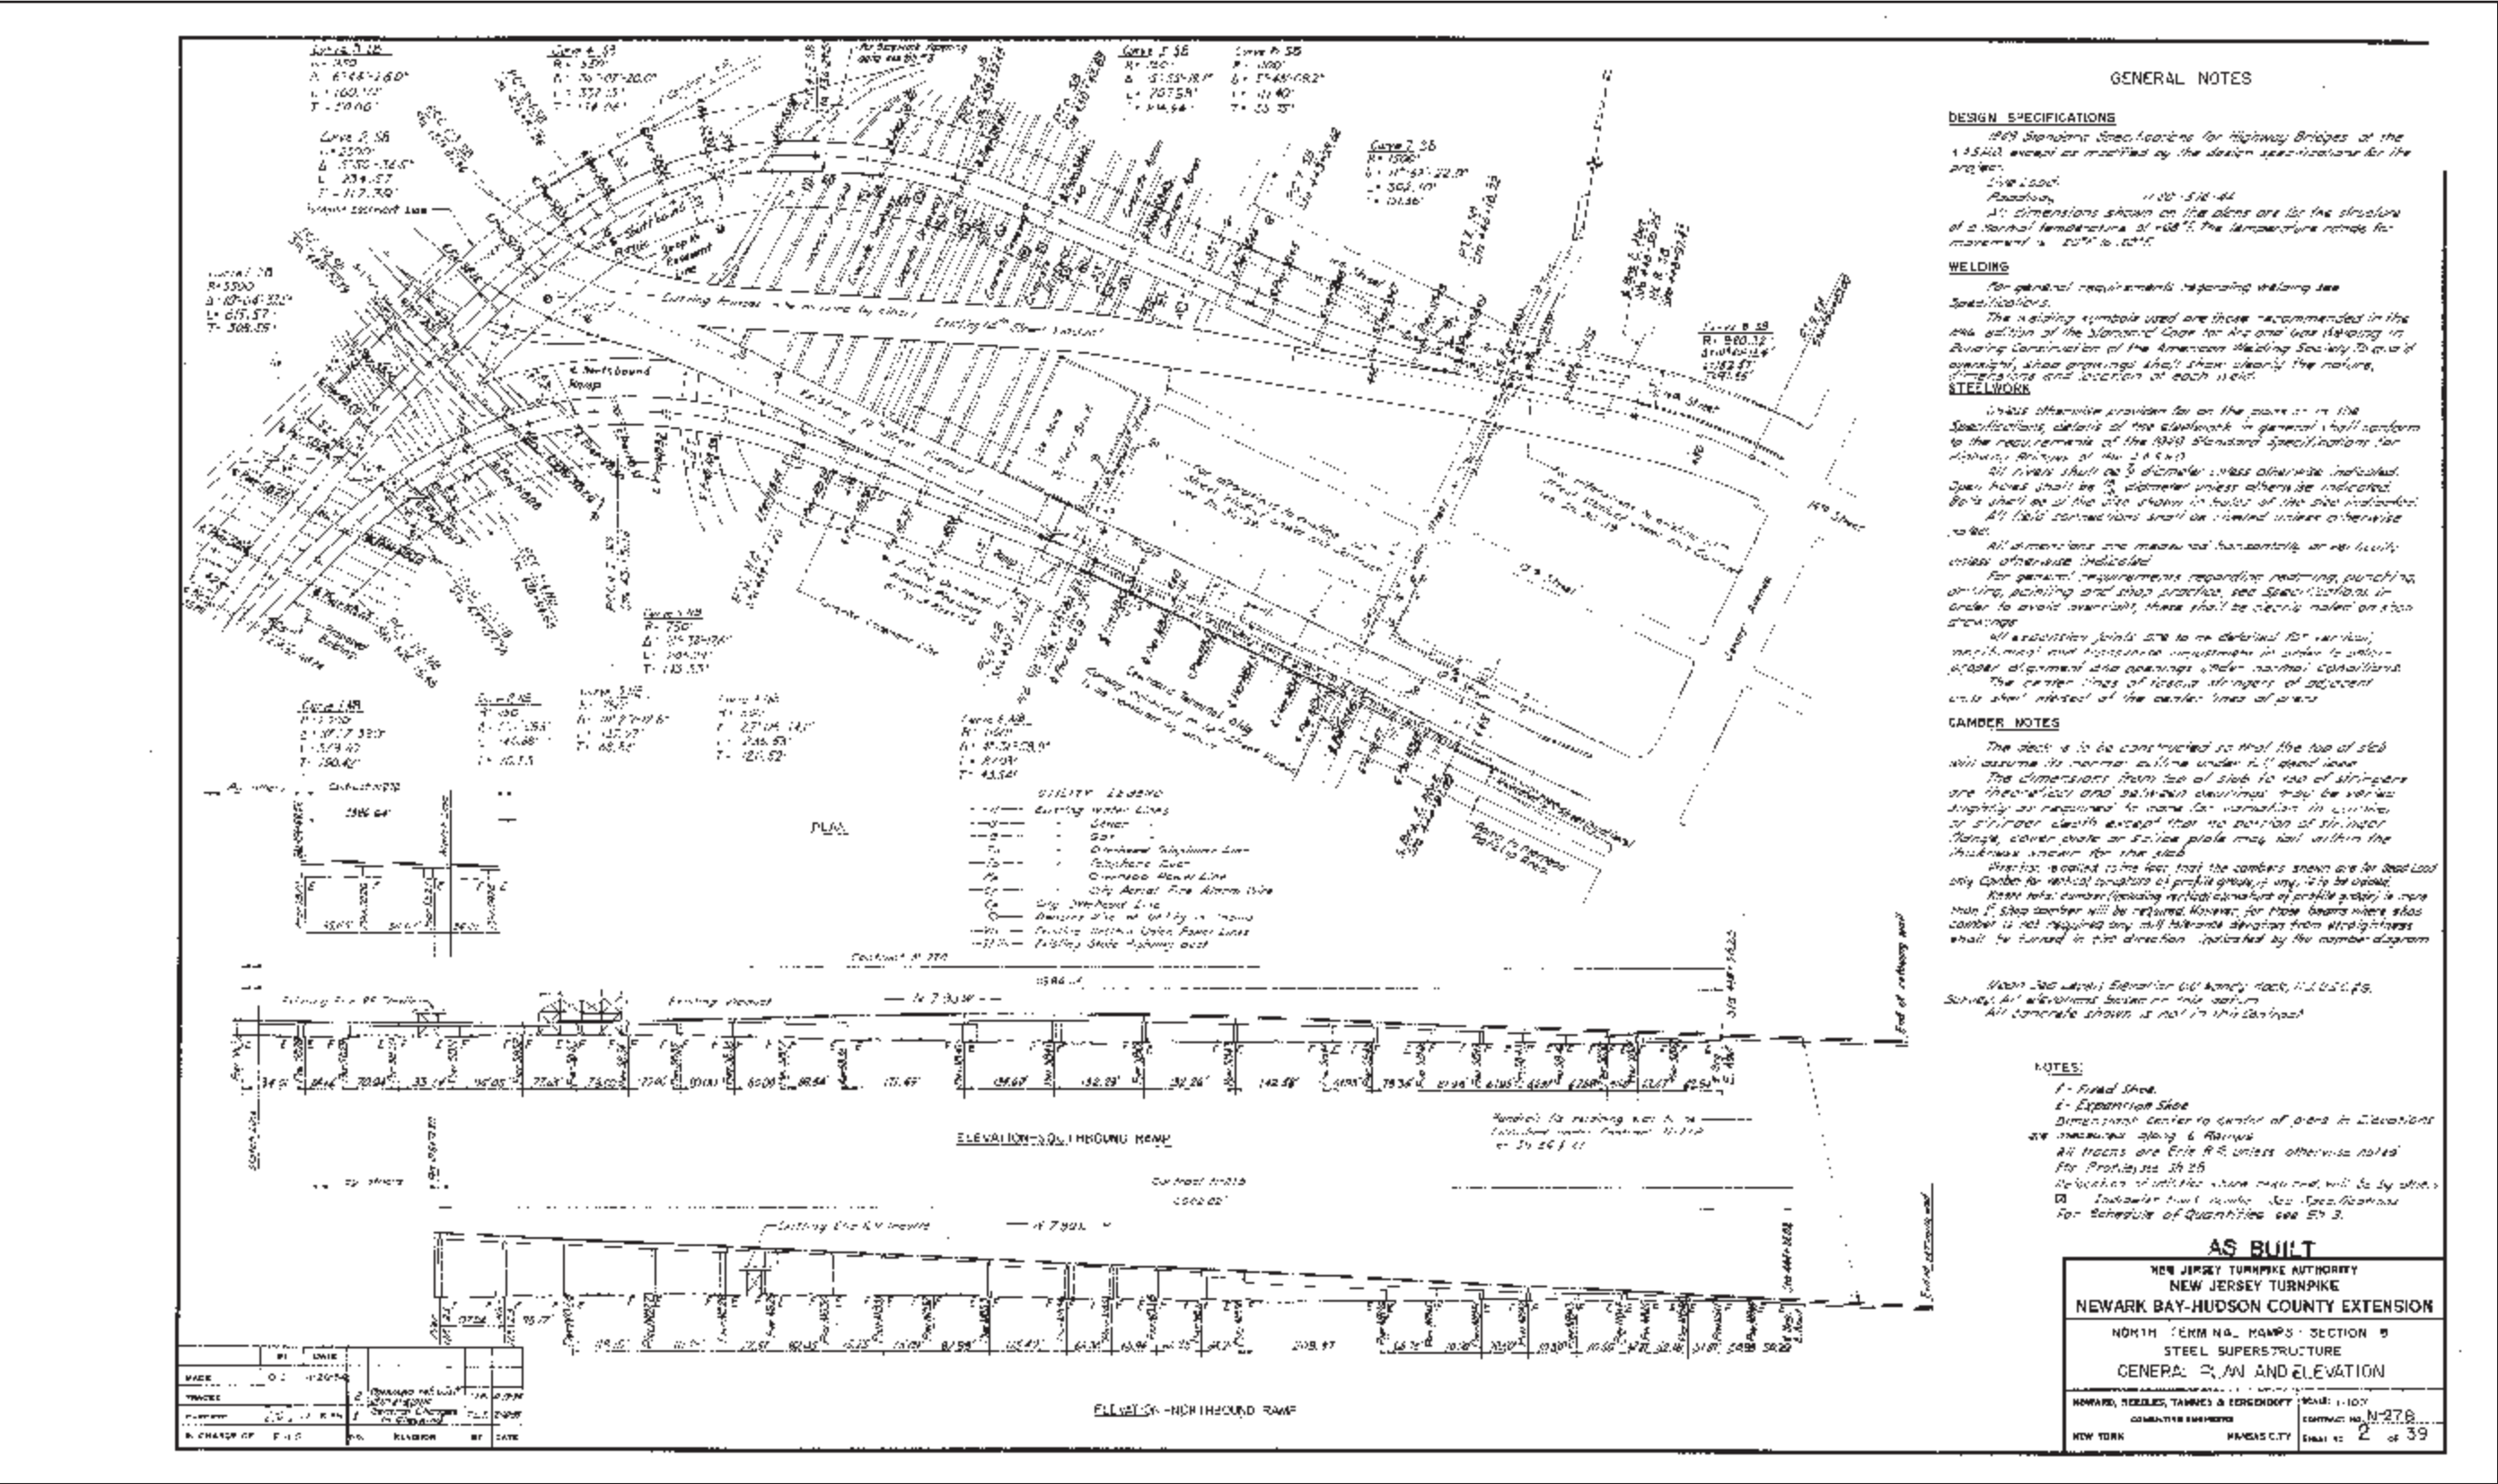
1955 as-built drawing showing the general plan and elevation of the North Terminal Ramps, Section B (HNTB 1955).
